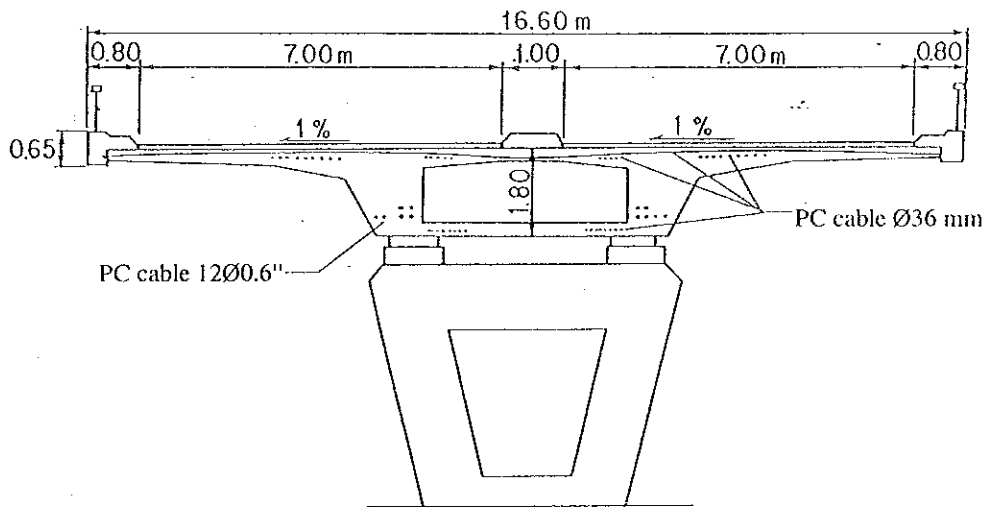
Cross Section of Zamalek Elevated Bridge
